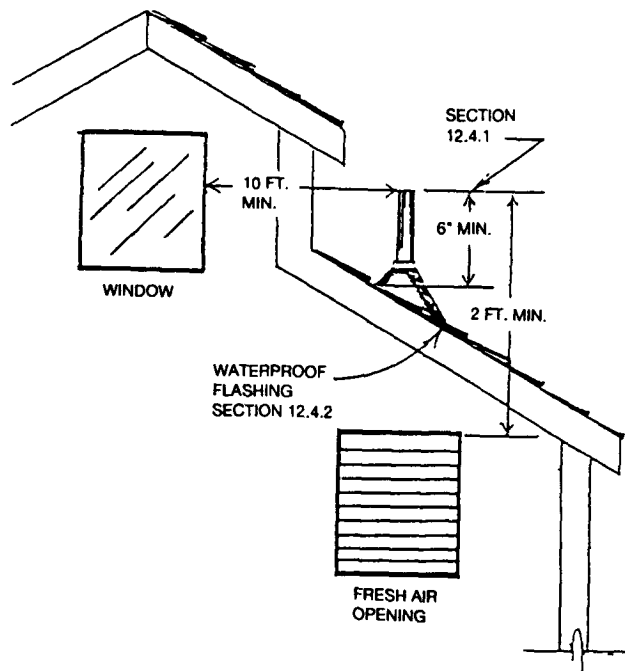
EXAMPLE OF A TYPICAL VENT TERMINAL
